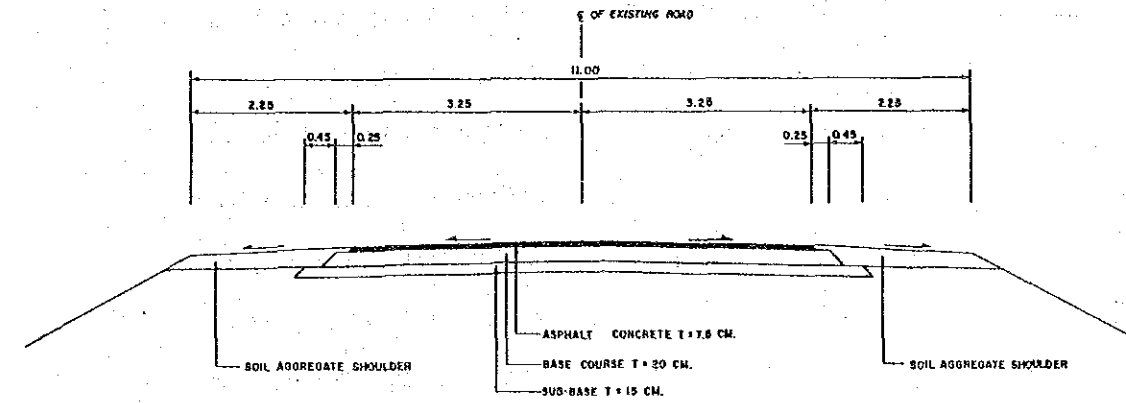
FIGURE TYPICAL PAVEMENT STRUCTURE FOR FLEXIBLE PAVEMENT IM-17
